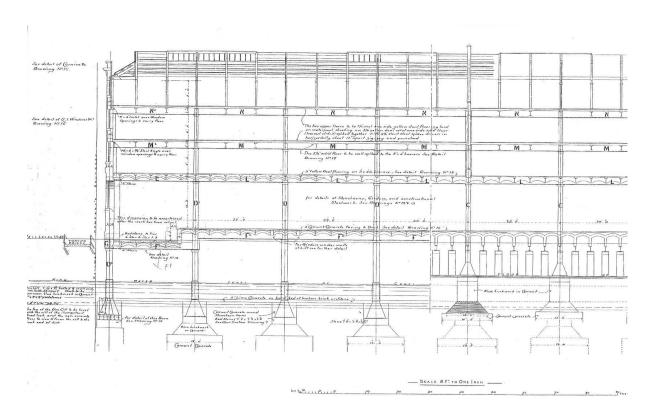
Part of Long Section, 1901. It shows the jack-arched ceiling at lower level under rail tracks, at higher level under platform over dock and with platform raised on sleeper walls over basement
